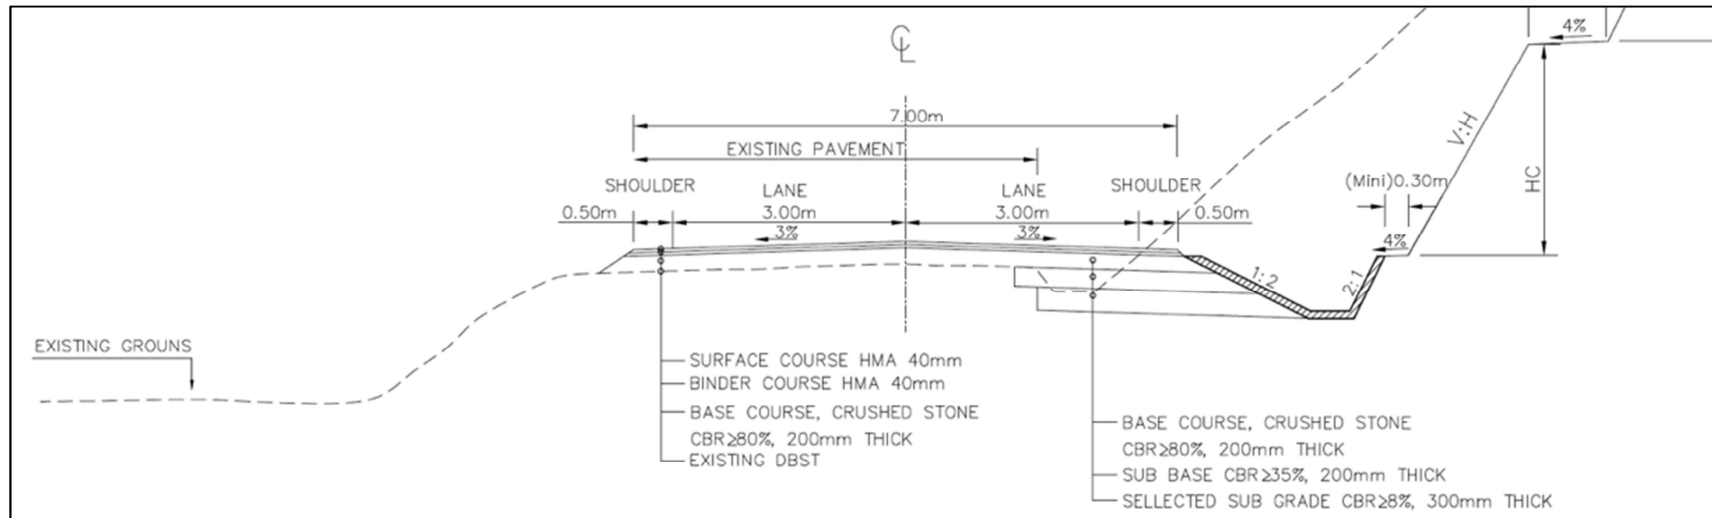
Cross Section Raised Profile (in flat and rolling) (TC3)
